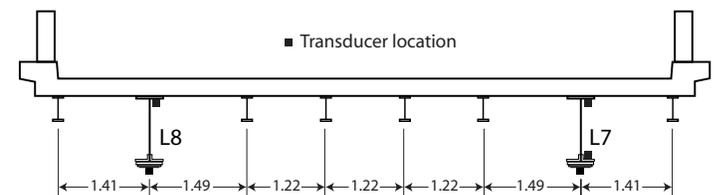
Example cross section of an instrumentation layout for a diagnostic load test
